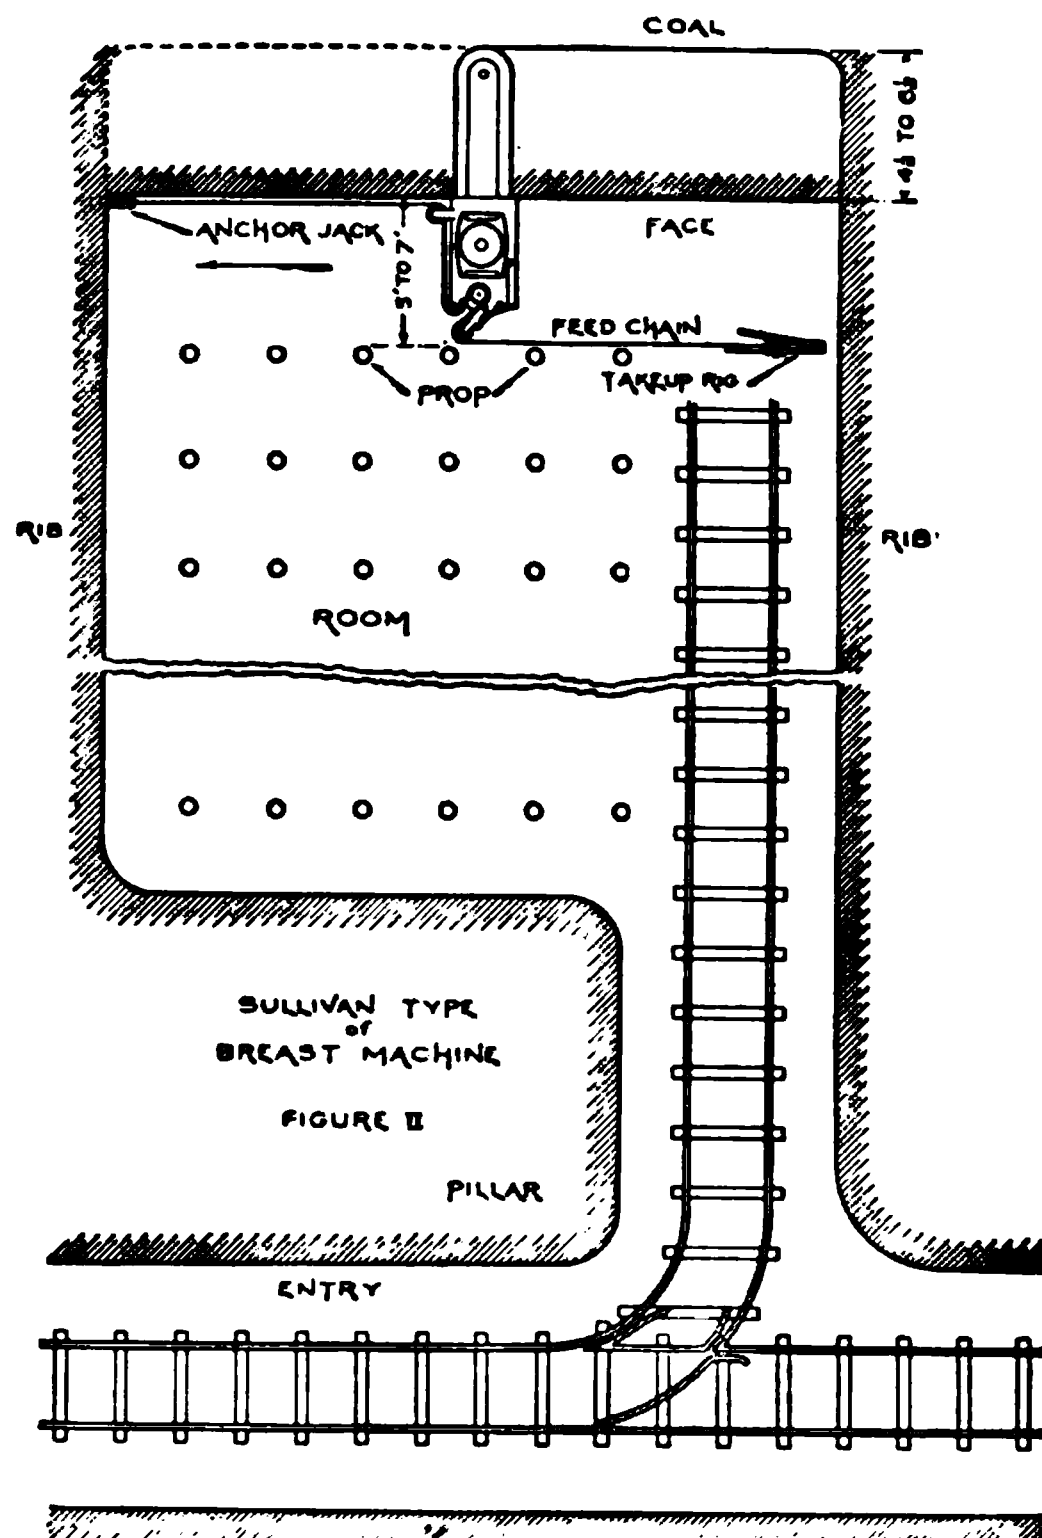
Showing Position of Sullivan Coal-cutter in a Room.
